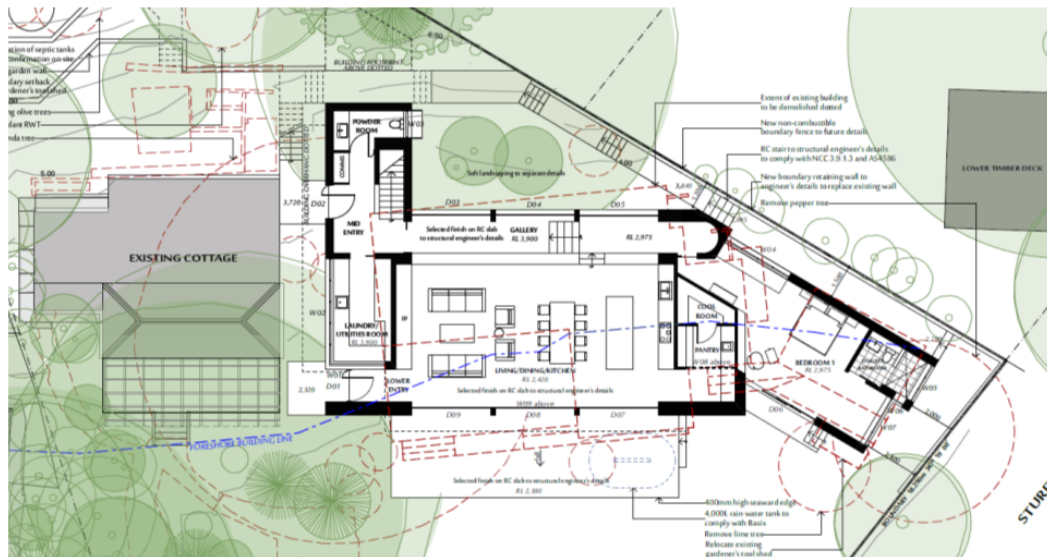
Plan extract showing the existing and proposed building outline relative to the foreshore building line shown in blue existing building outline relative Foreshore building line map extract with subject site shown by red star
